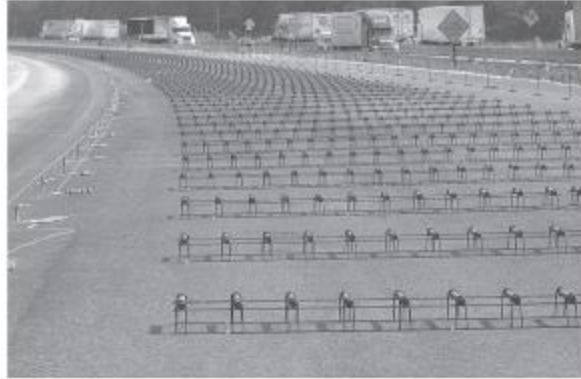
Setting Dowels Prior to Pavement Construction Using a Paver (El-Korchi & Mallick, 2013)
